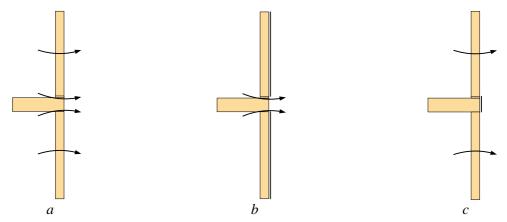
The test section consists of CLT wall and floor sections. The air leakages are measured through the whole test section (a), through the floor section (b) and trough the wall sections (c)
